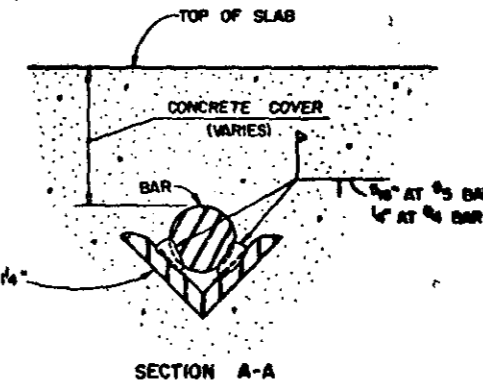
DETAIL FOR LATEX MODIFIED CONCRETE OVERLAY
